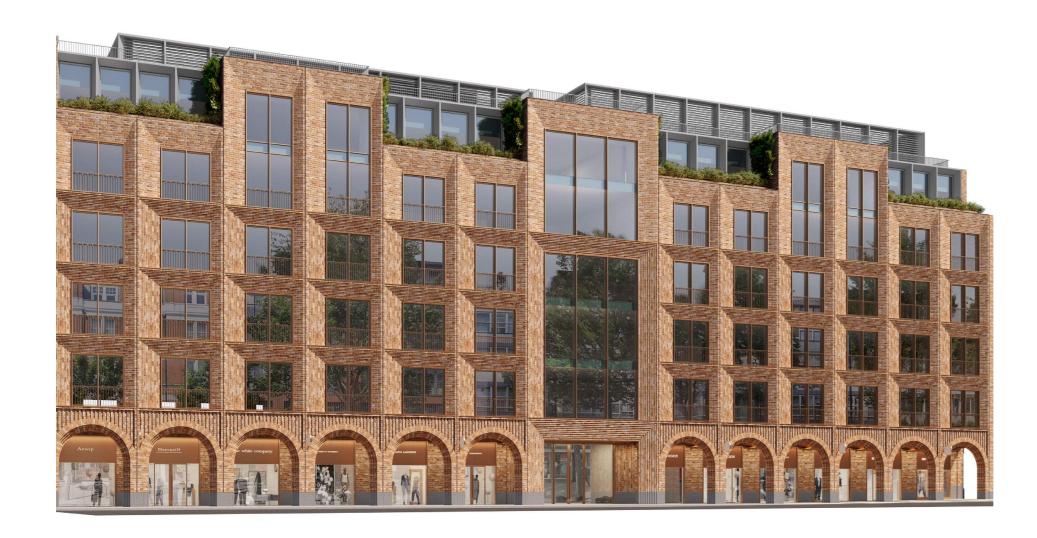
Illustrative Proposed East Elevation of the Kensington Church Street Building
